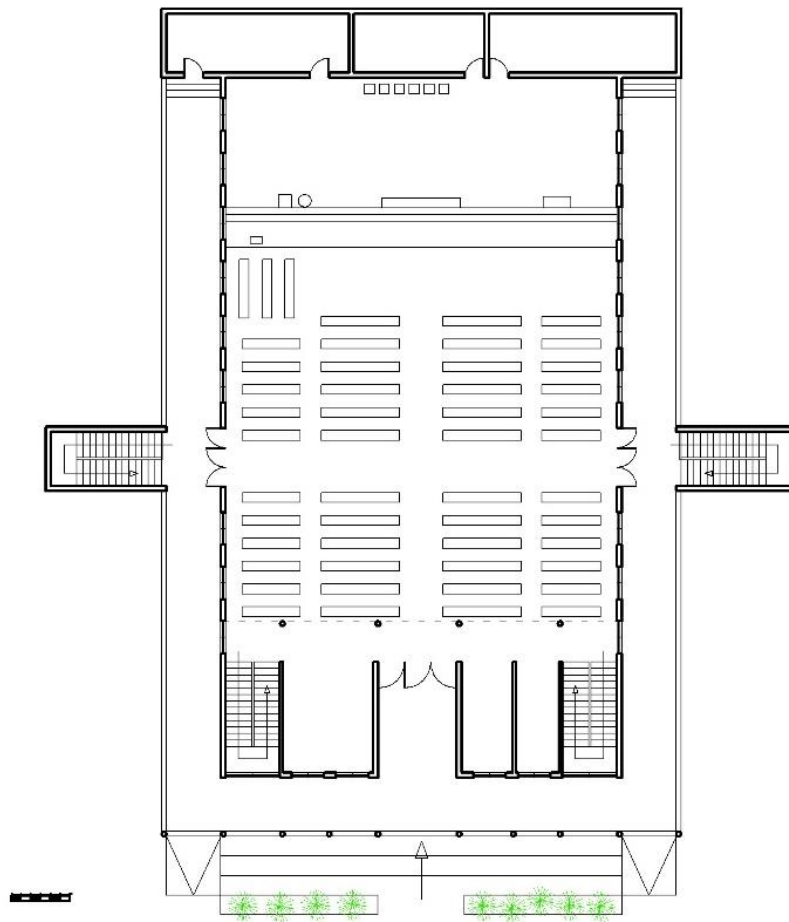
Ground floor plan, St. Patrick Church Building Bashorun.
